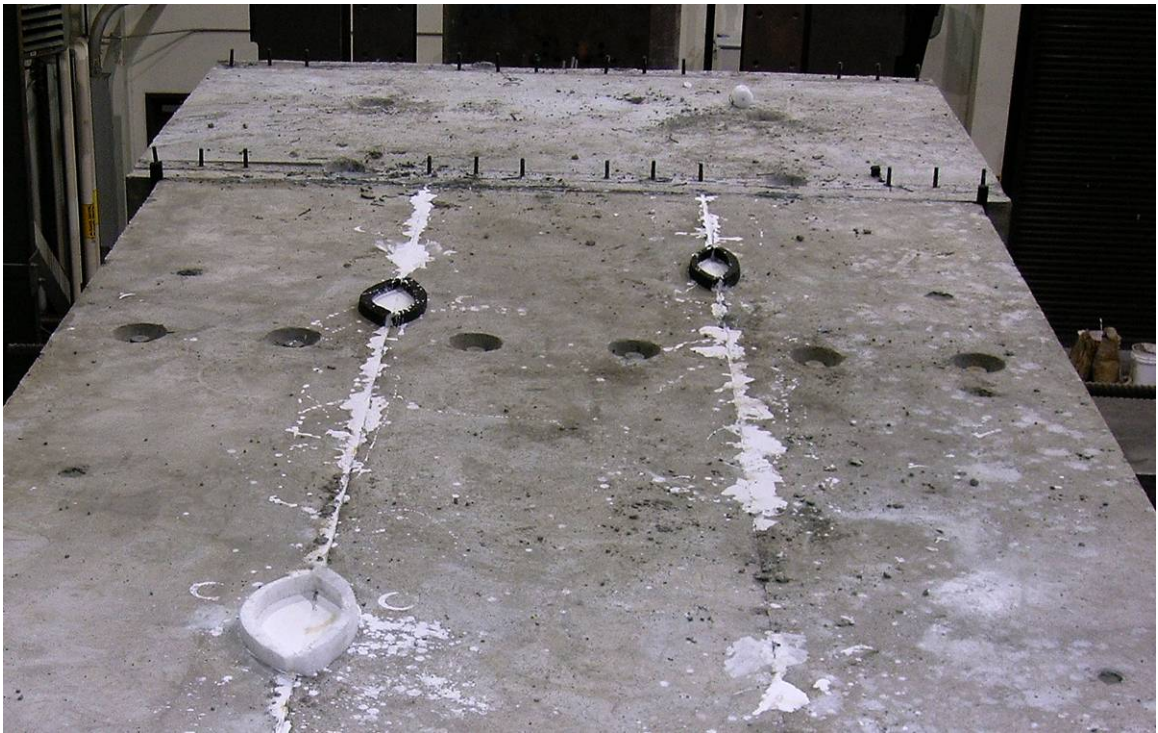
Locations used to pour hydrostone between superstructure beams.
